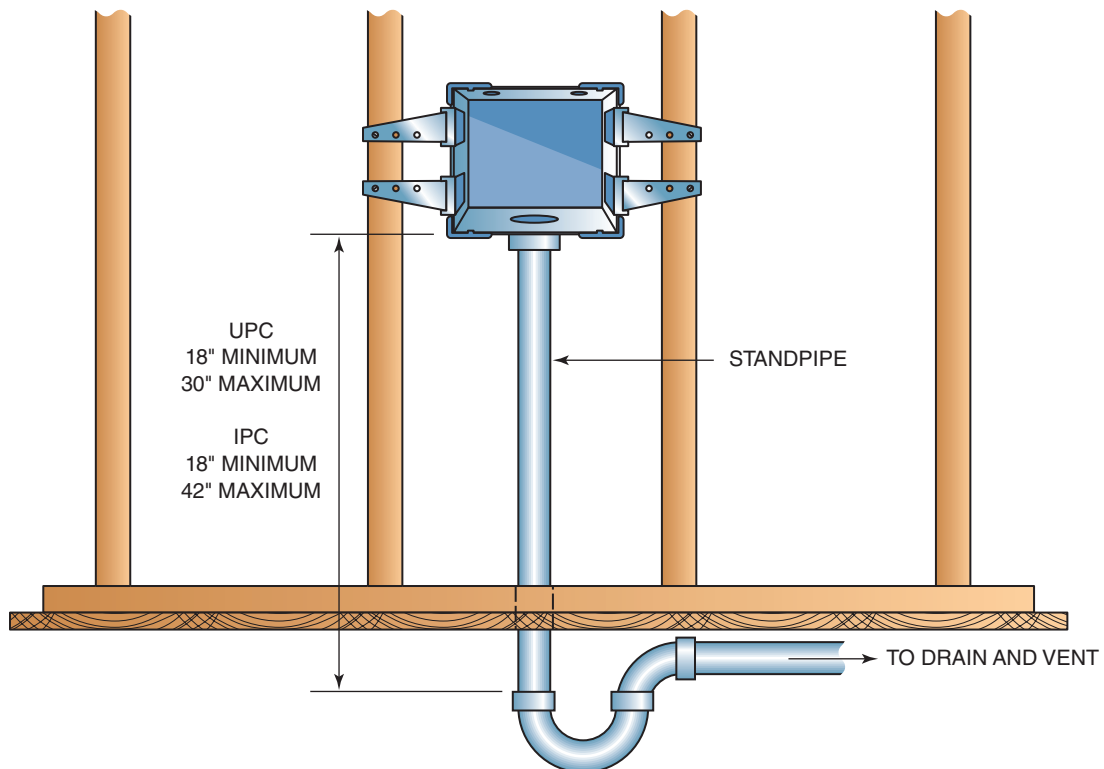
Some washing machine box installations may have the p-trap below the floor.
